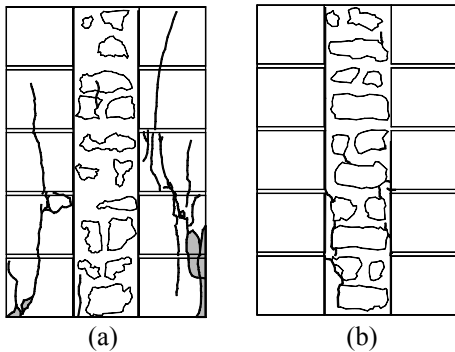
Ultimate failure patterns for the wallets with straight collar joints: (a) Noto (NS3) and (b) Serena (SS3).
